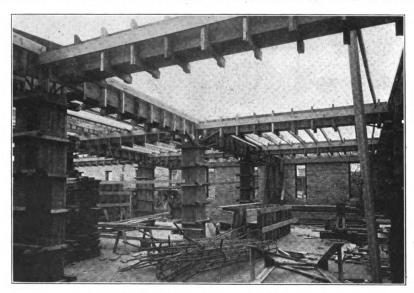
View Showing Forms for Inclosing Grills for Beams, Girders, &c.
